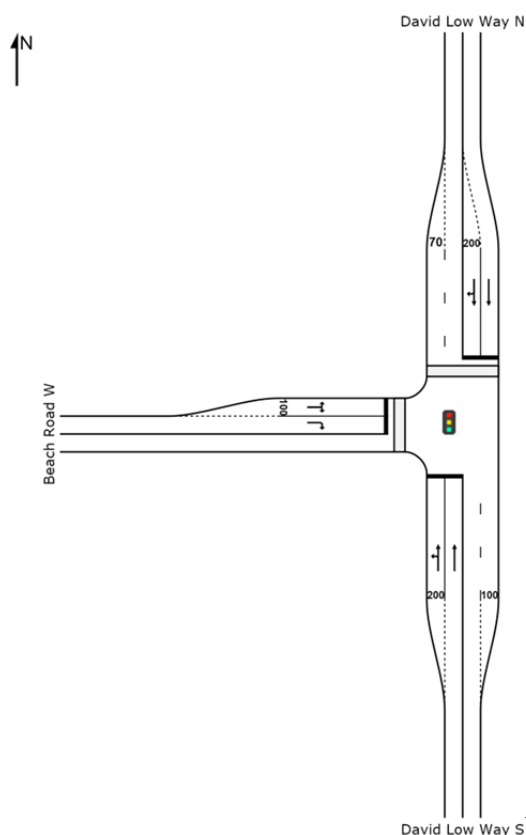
Beach Road / David Low Way Intersection Upgrade Option Layout
